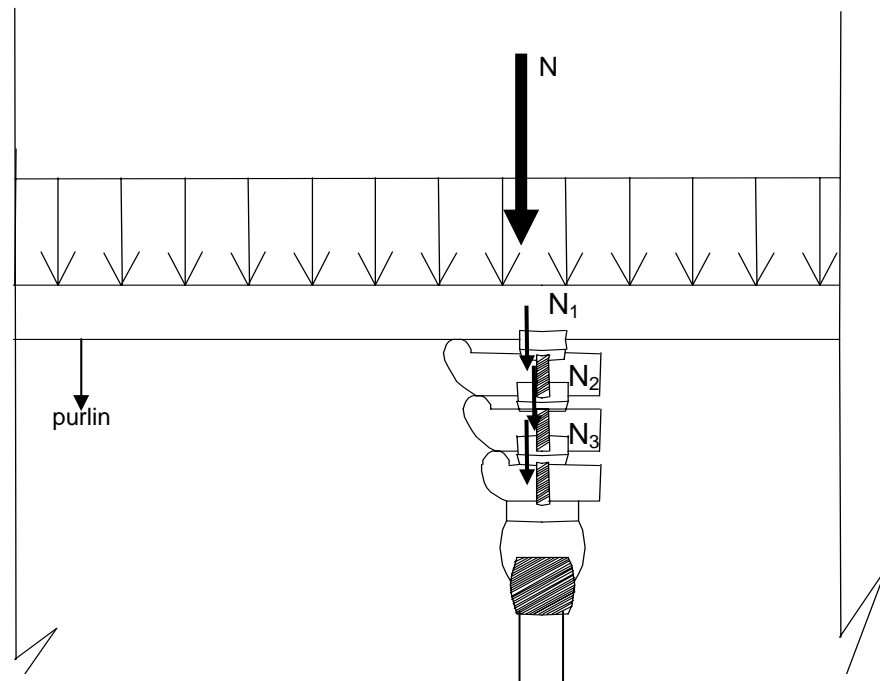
Loading of Dieh-Dou building (out-of-plane)
